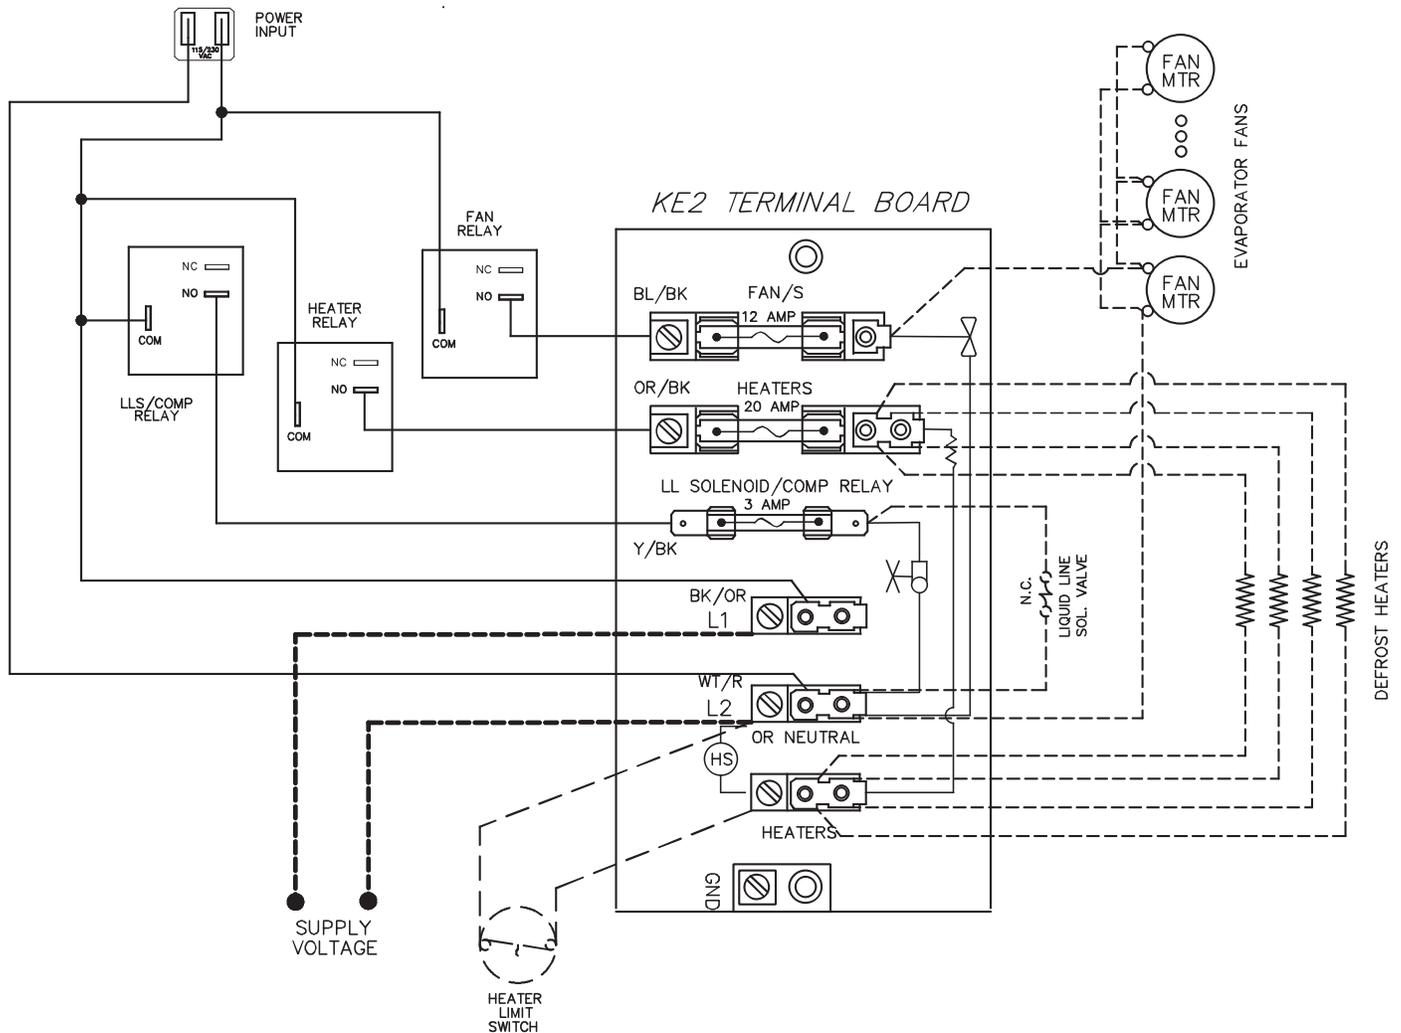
Wiring Schematic - Using KE2 Terminal Board
